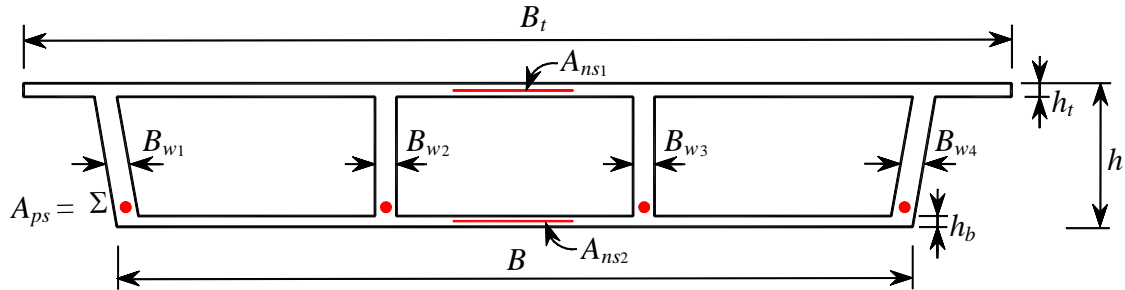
Geometric dimensions and reinforcement in a typical bridge cross section.
